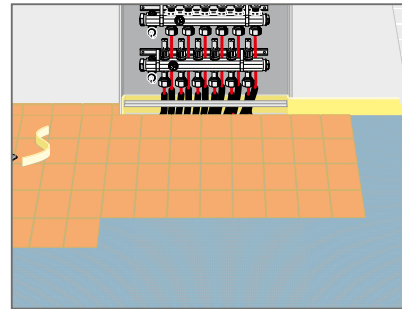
Laying down the floor tiles according to the manufacturer's instructions
